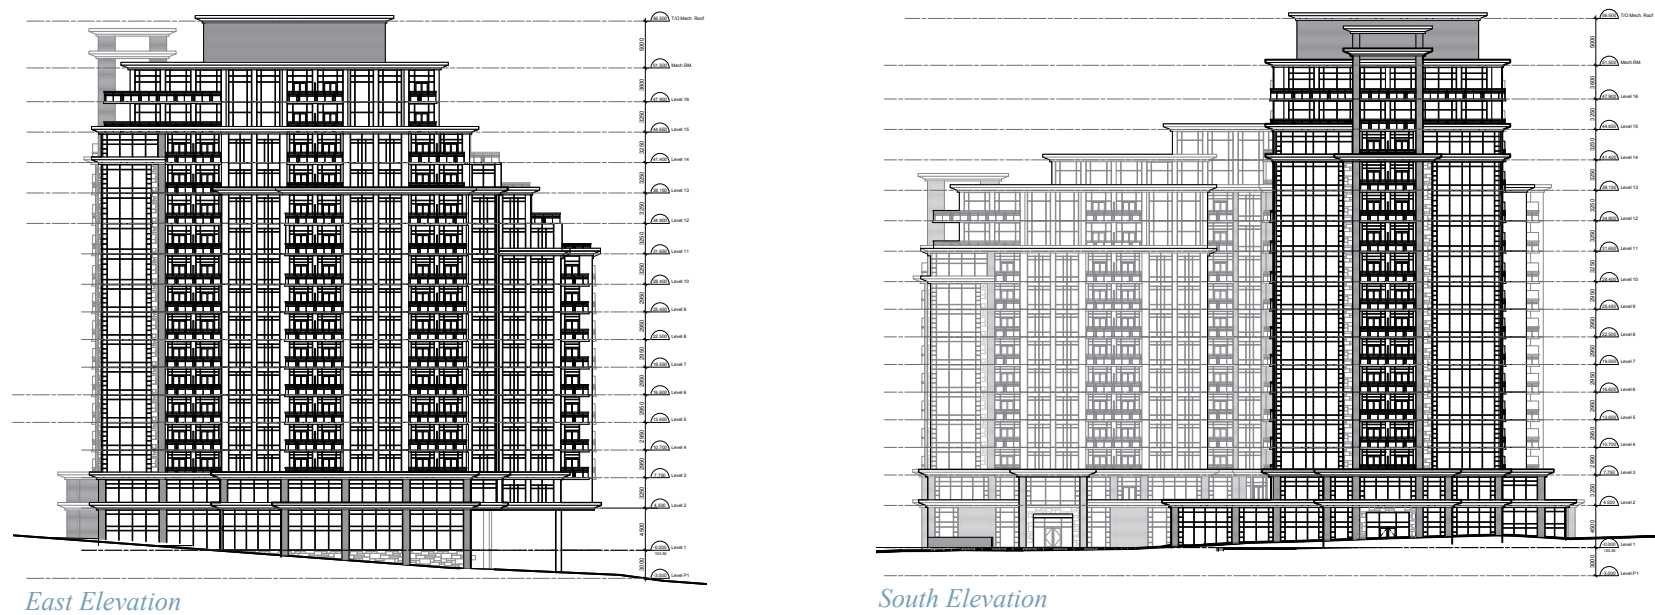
Proposed development at 2490 Bloor Street West (Building B), Elevations
